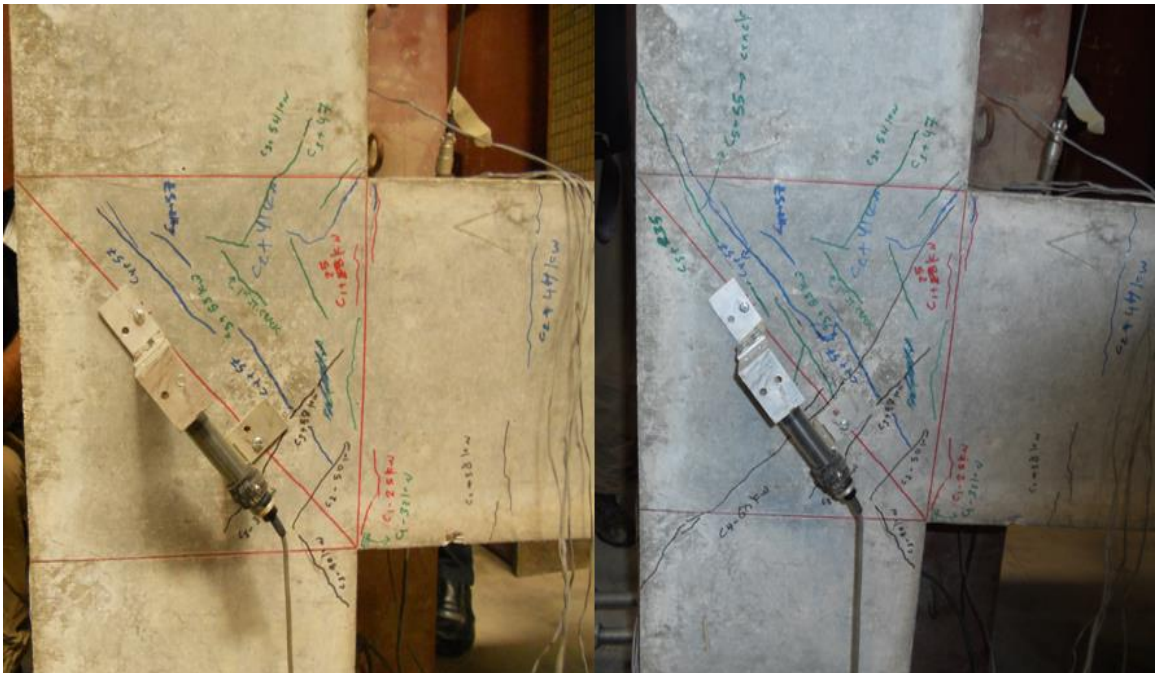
Formation of crack in joint during cyclic load test in specimen BCJ-12MM-Bent Up
